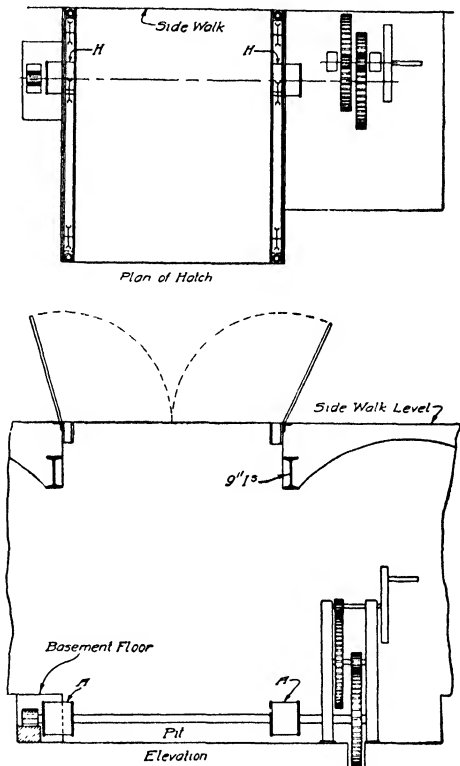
Gear Drum and Sheave Arrangement for Basement Elevator
